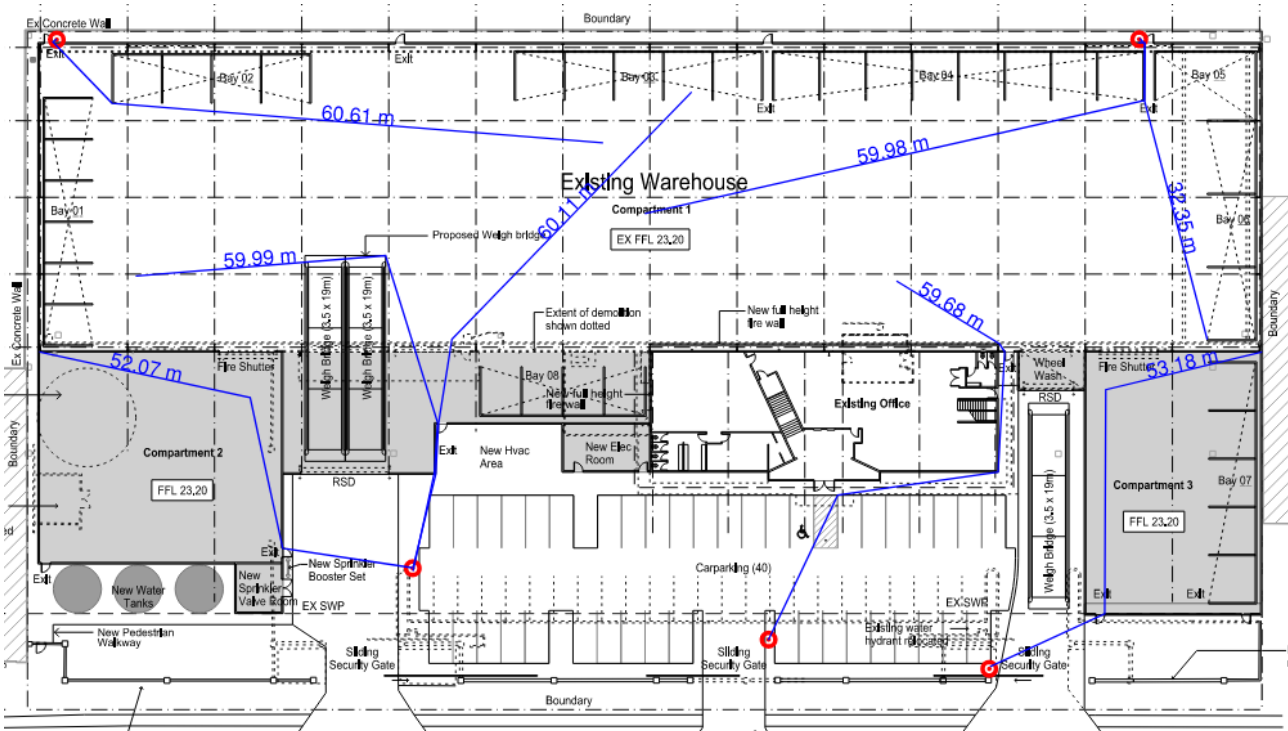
Indicative Location of Fire Hydrants Shown in Red – Coverage Based on Open Plan Layout
